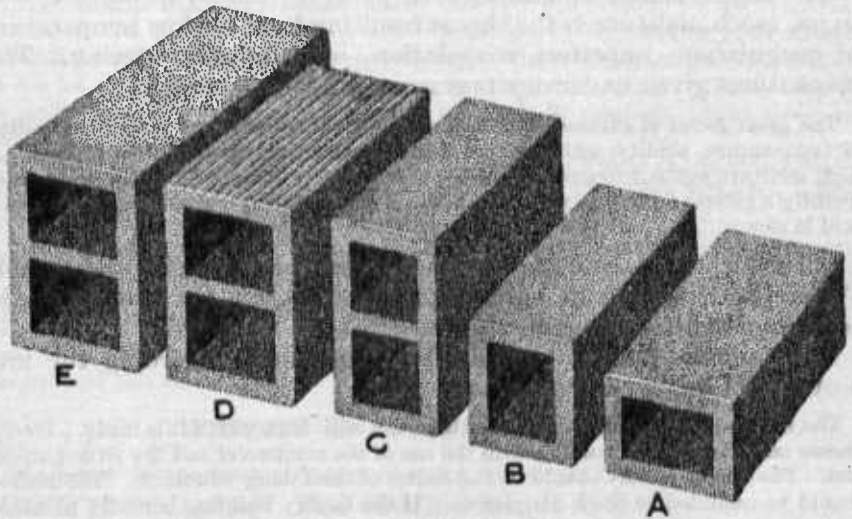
Five sizes of hollow vitrified clay building blocks used in silo construction.
